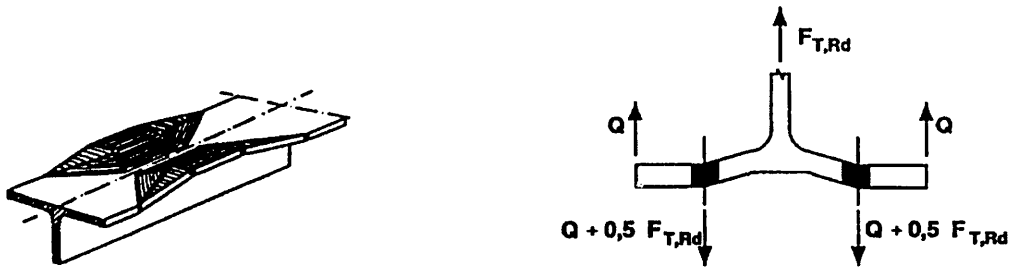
Mode 2: Bolt failure with complete yielding of flange
